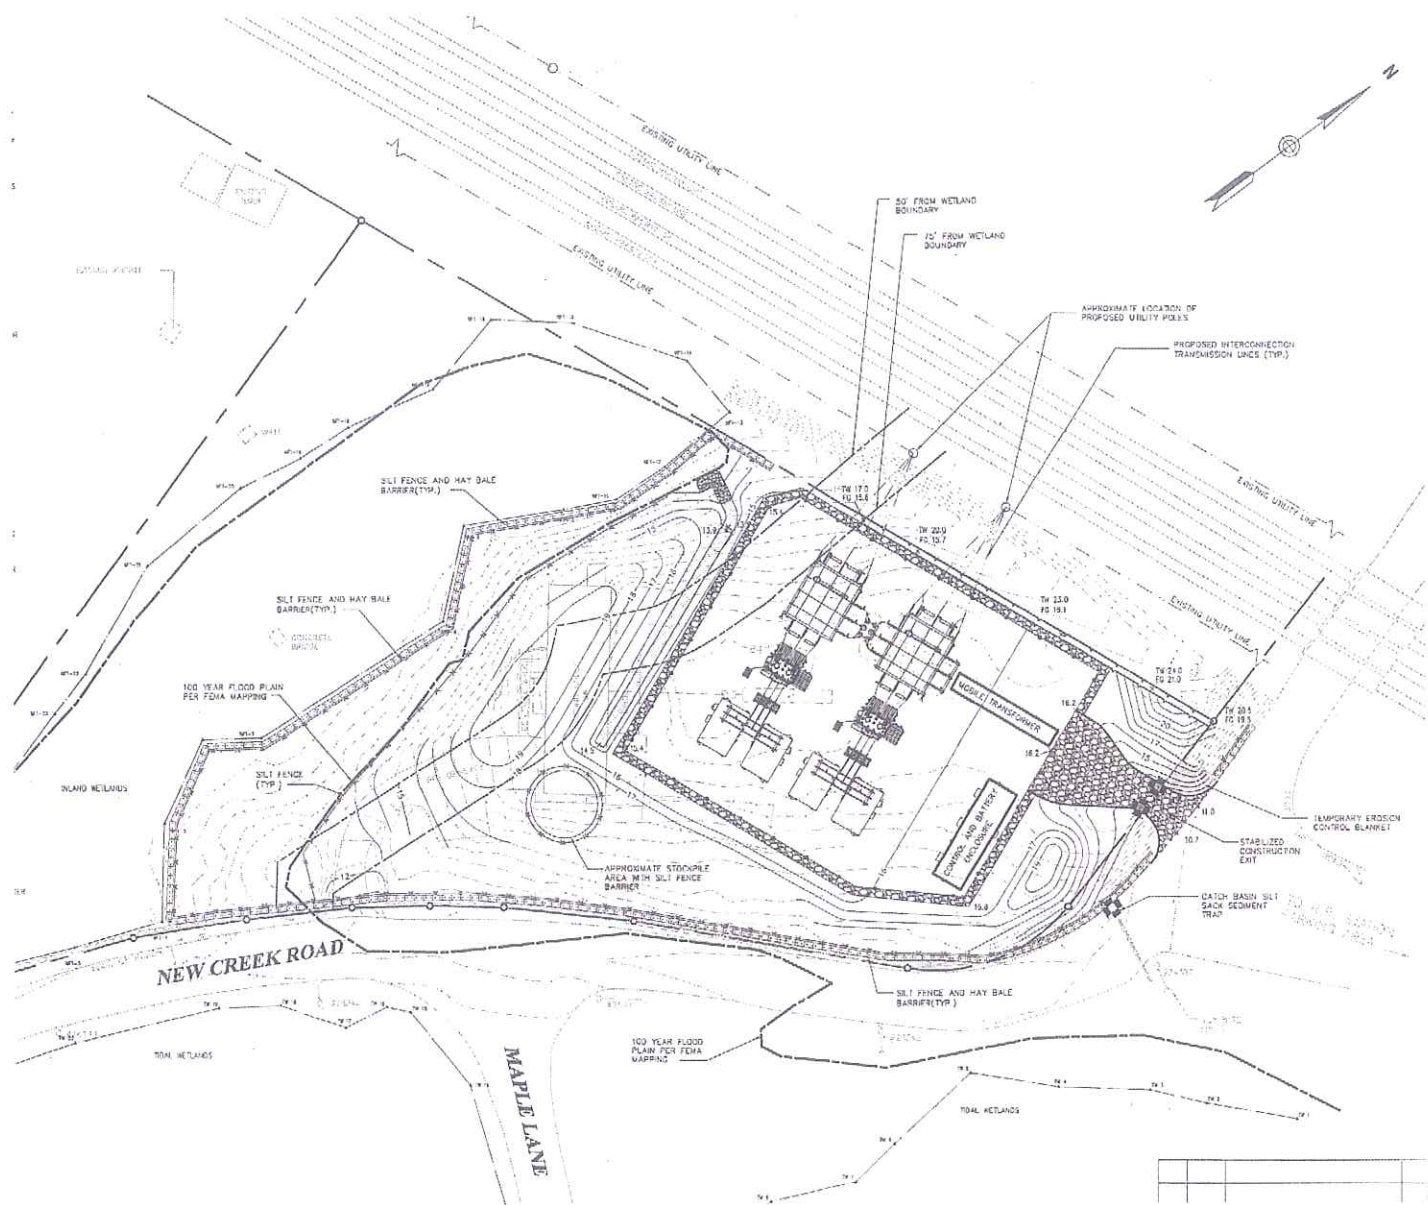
Proposed Sherwood Substation site plan. (CL&P 7)
